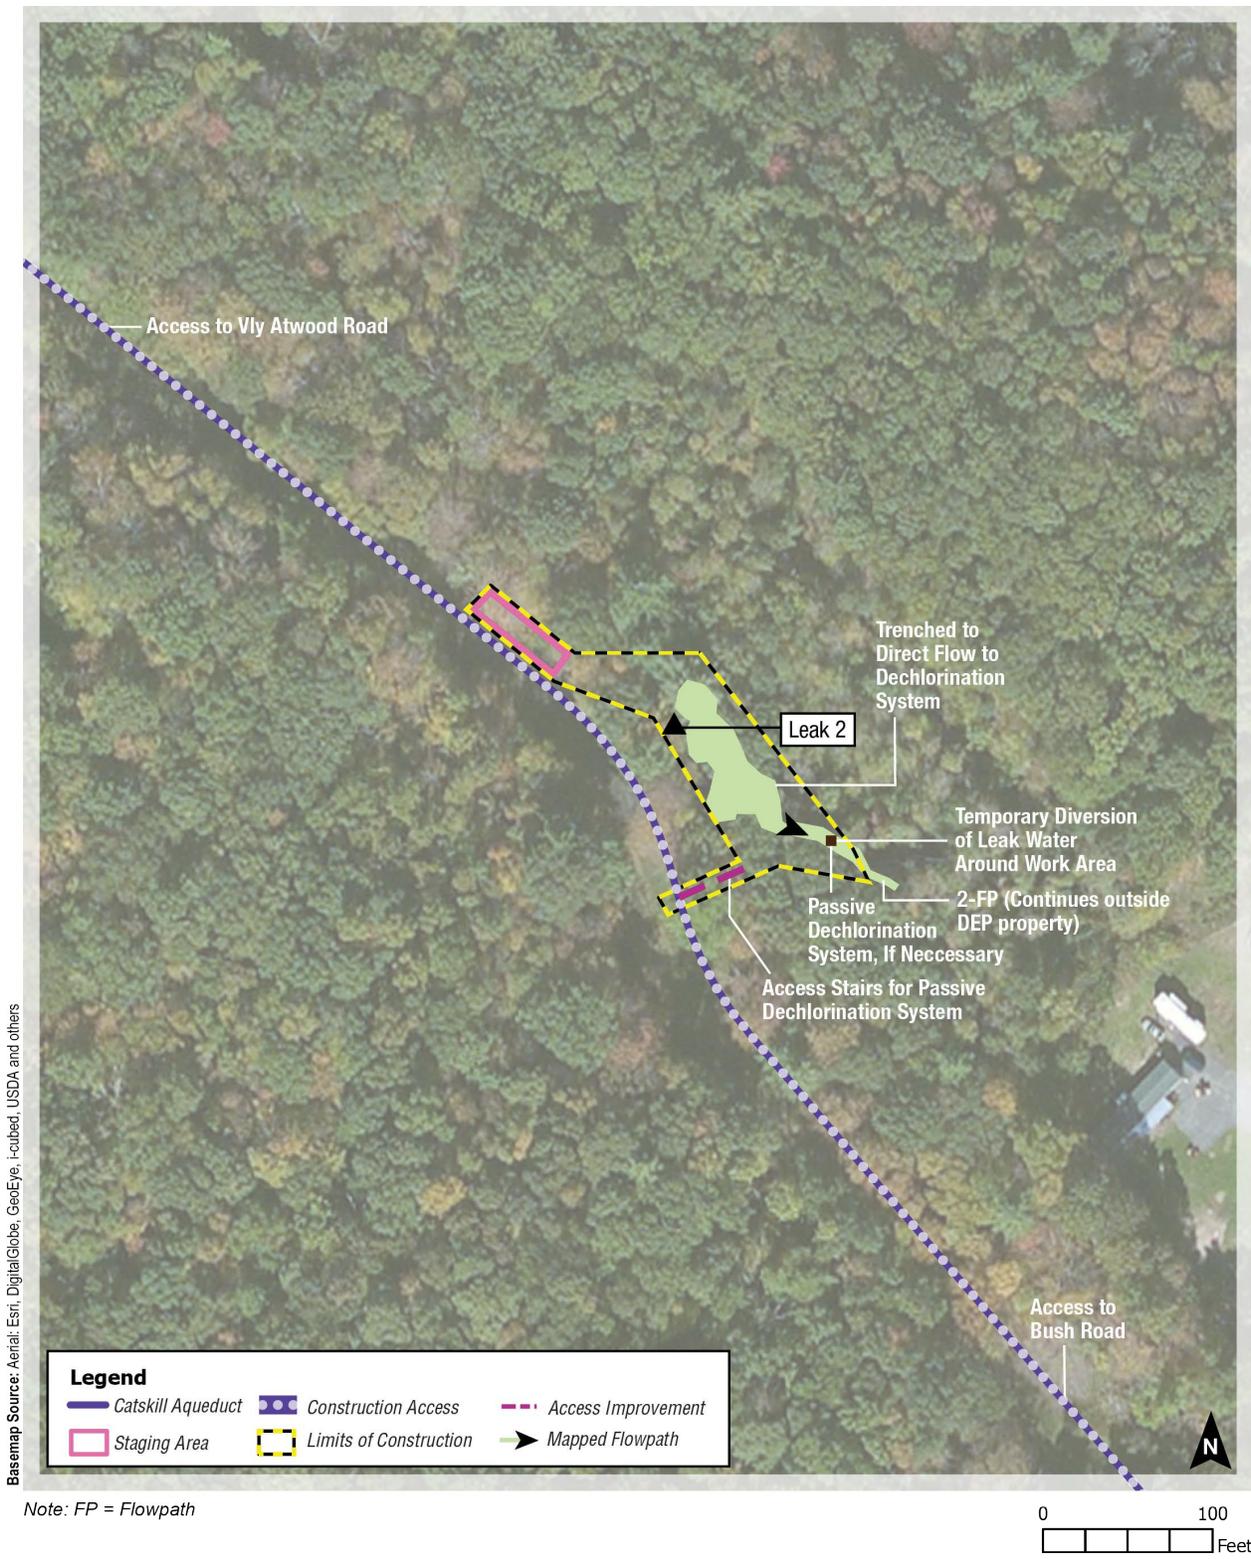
Site Plan for Leak 2 – Vly Atwood Road Study Area
